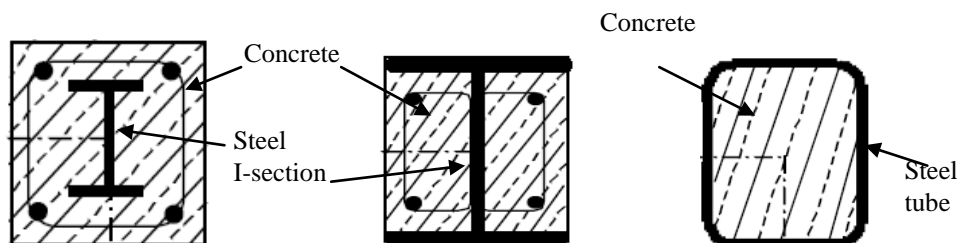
Typical cross-sections of (a) Fully encased composite column (FEC), (b) Partially encased composite column (PEC) and (c) Concrete filled tubular sections (CFT).
